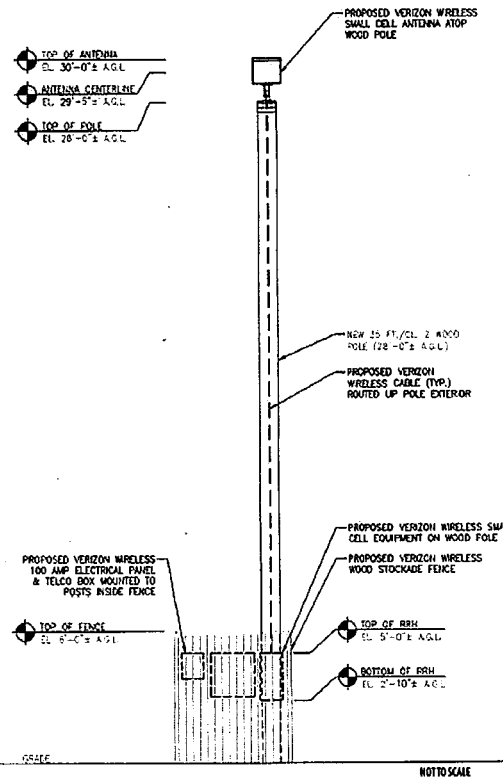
PROPOSED EQUIPMENT LOCATION AND ELEVATION PLAN FOR ANTENNA SC-2 CT
